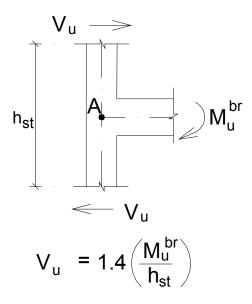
Column shear due to plastic hinge formation in transverse beams
